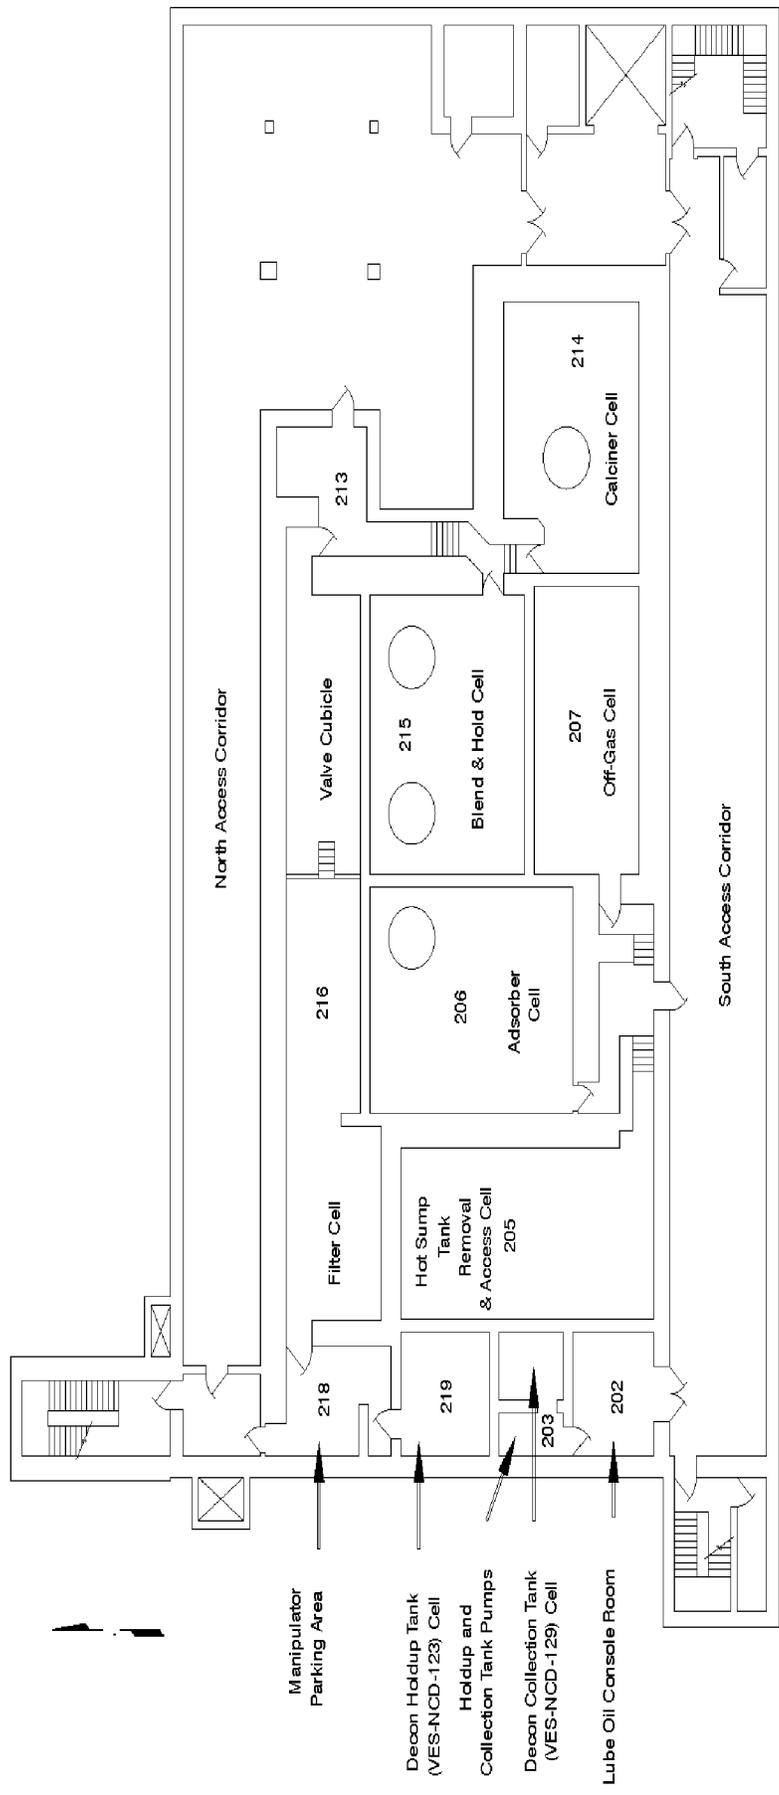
Simplified floor plan for first level of CPP-659.
